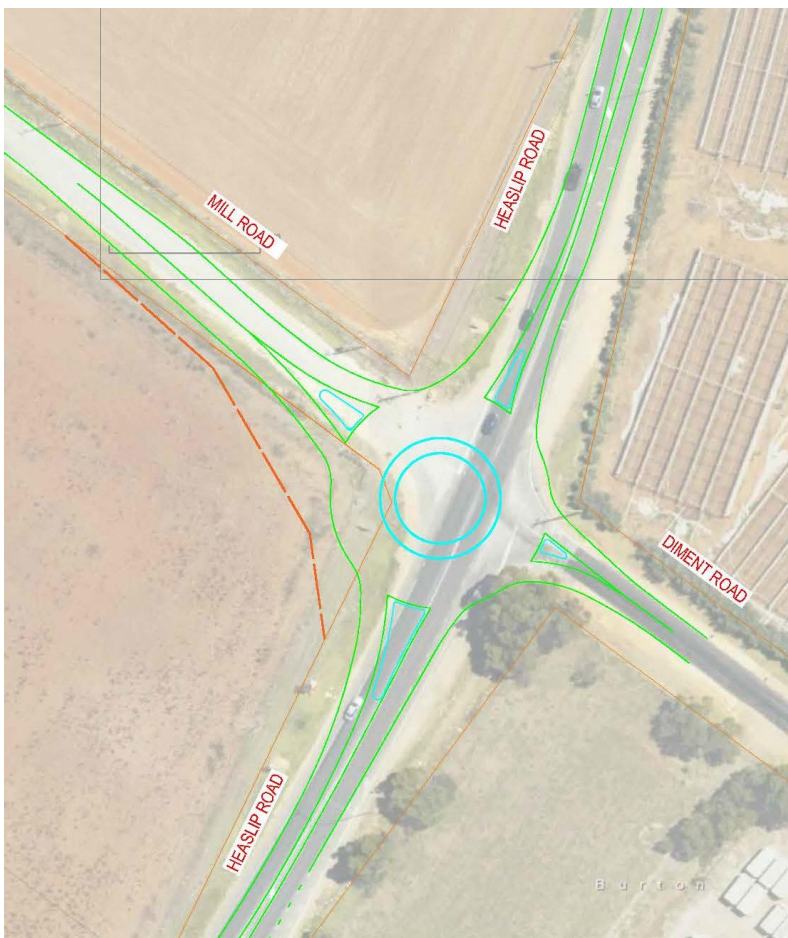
Roundabout treatment at the Mill Road/Heaslip Road/Diment Road intersection
